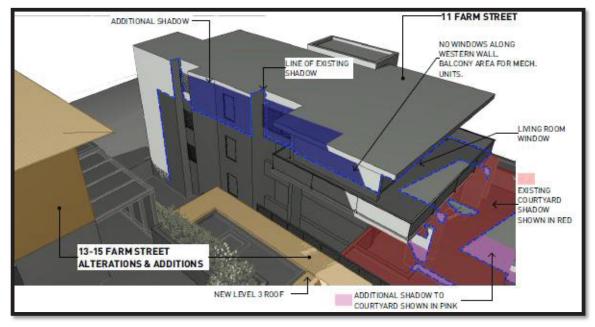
Additional overshadowing onto 11 Farm Street at 3pm to a bedroom and study room window and minor increase to the courtyard.
